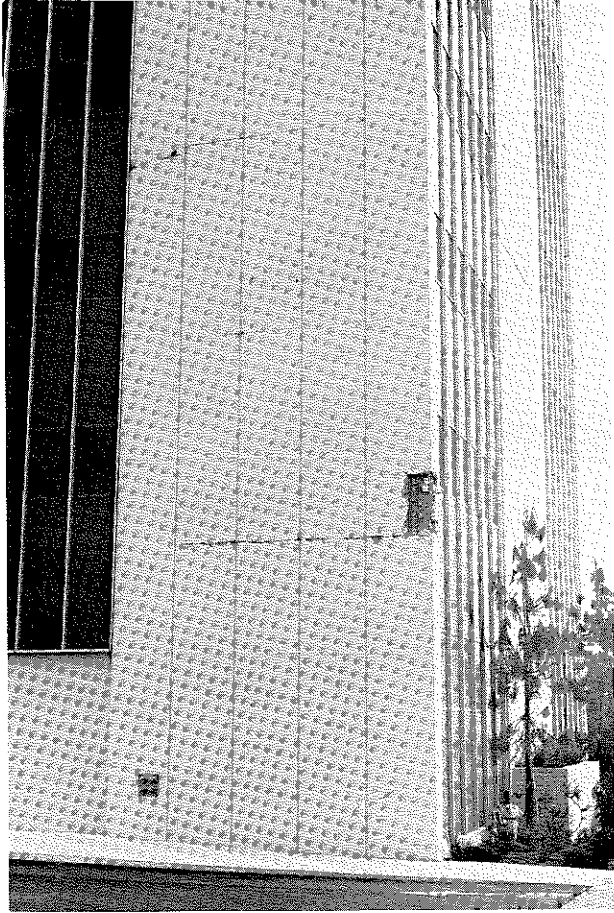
Cracking and spalling on western wall, north elevation of Indian Hills Medical Center.
